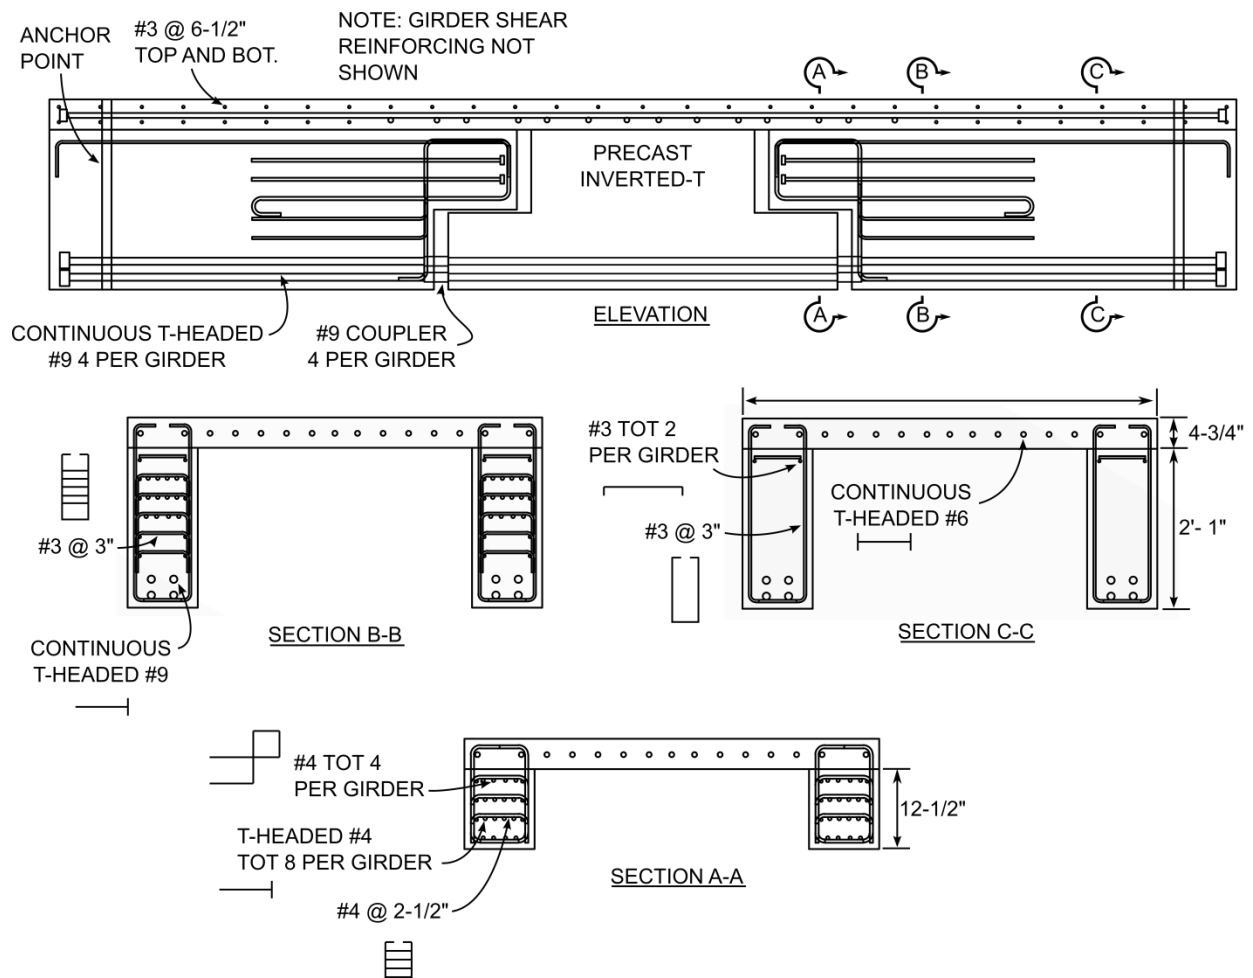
Deck and Longitudinal Girder Reinforcing Details for Specimens ER96L, ER103L, and WD103
